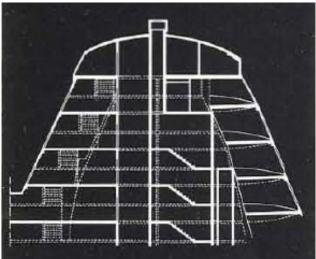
The Liberation newspaper office is located in Paris on an inner street running parallel to the main street which takes its path from the place de la Republique (left). Conceptual sketch of repurposed garage plan (right).
